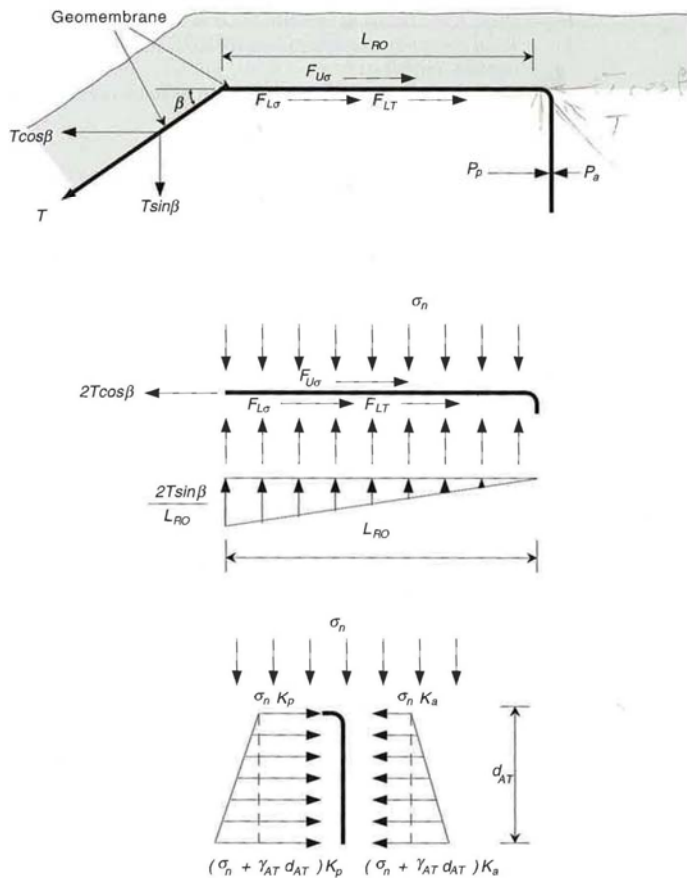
Cross section of geomembrane runoff section with anchor trench and related stresses and forces involved.
